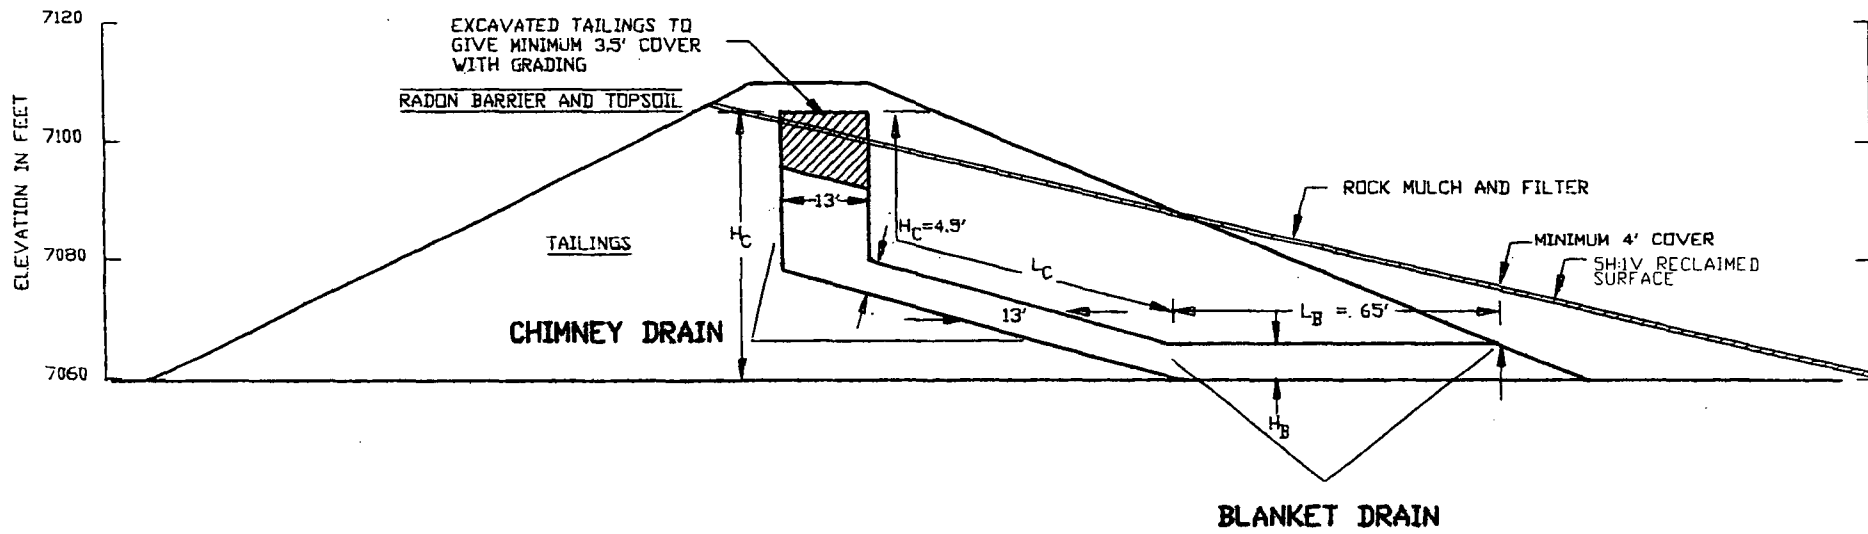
POND 5 DAM CROSS SECTION WITH RECLAIMED COVER AND EROSION PROTECTION
